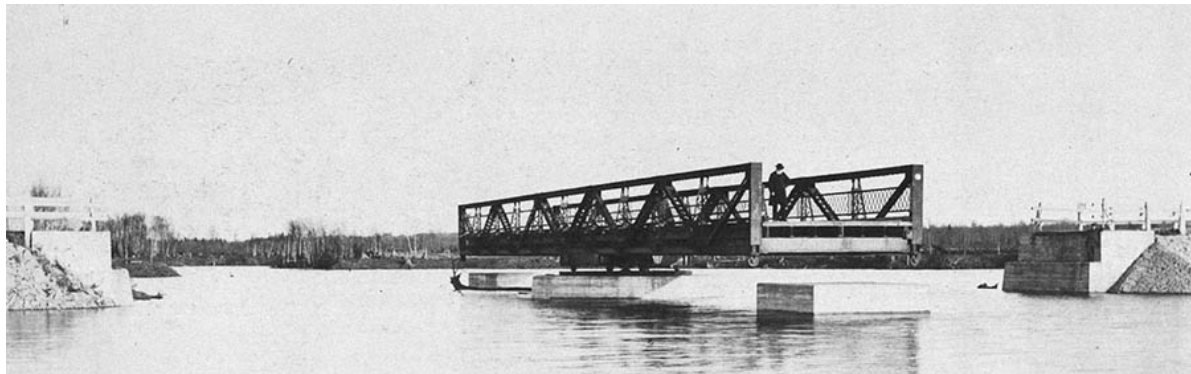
Boundary Road Bridge 1920. [Angus, 2000]
